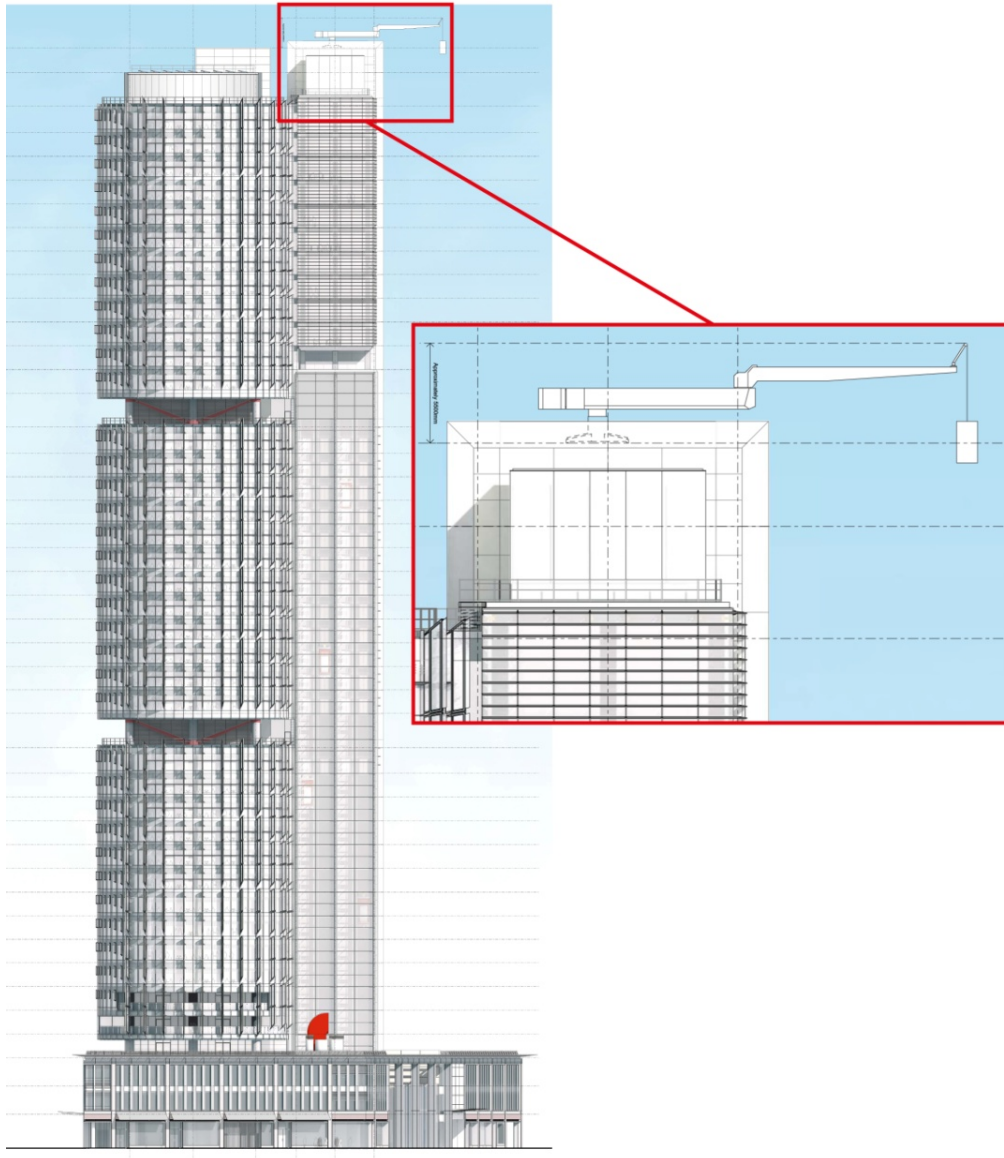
Elevation of Commercial Building C4 with a BMU (in the open position)
